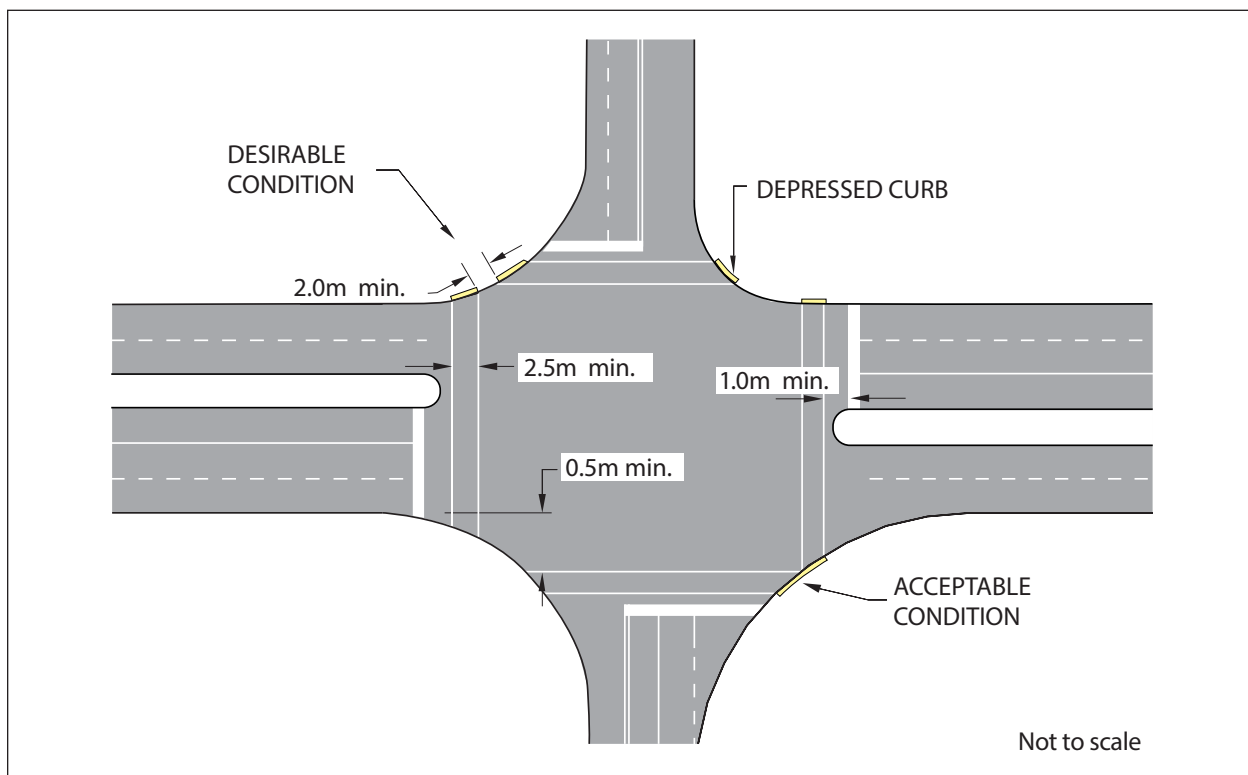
Typical Crosswalk Design with Standard Crosswalk Markings
